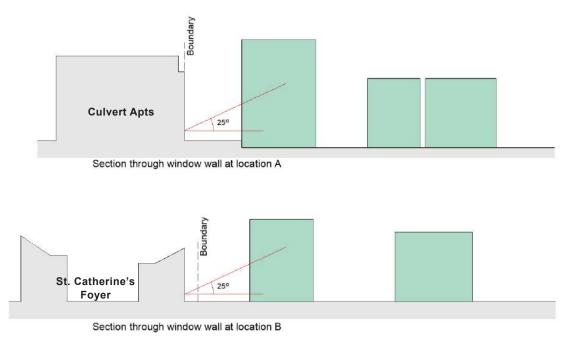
Section perpendicular to window wall at locations indicated in Figure 2.
